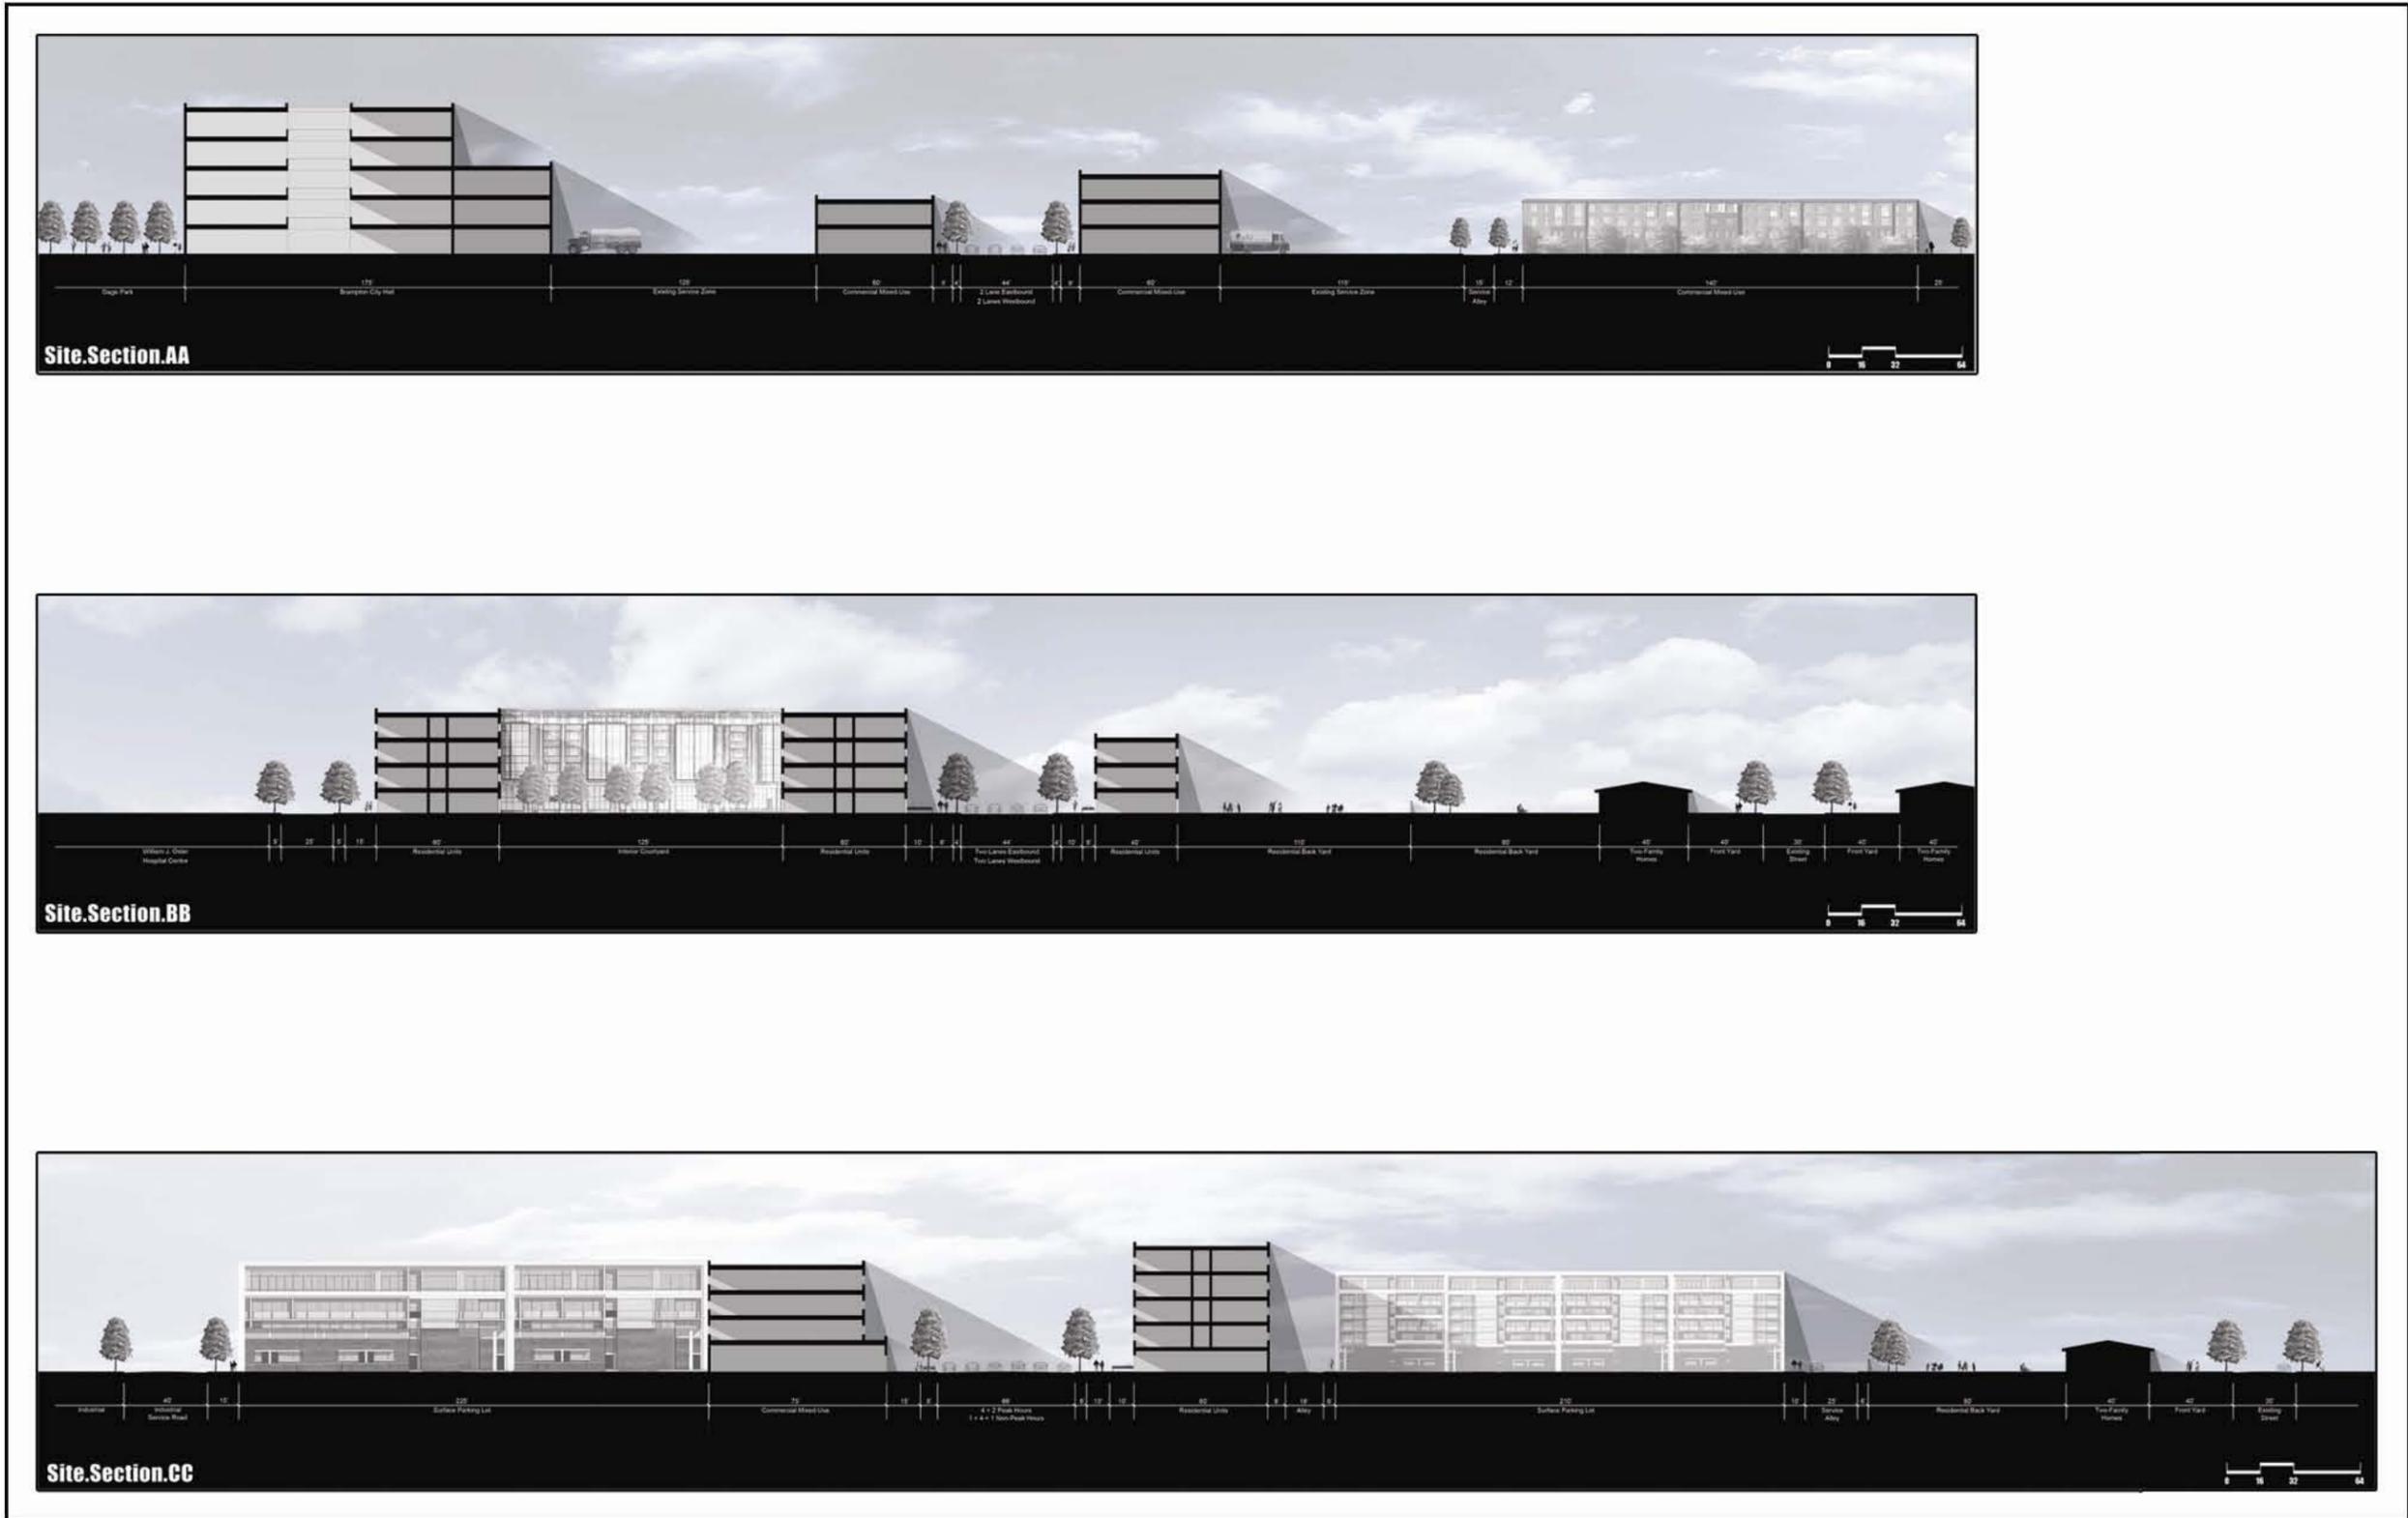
Urban Design Site Sections, Brampton, Ontario, Canada
